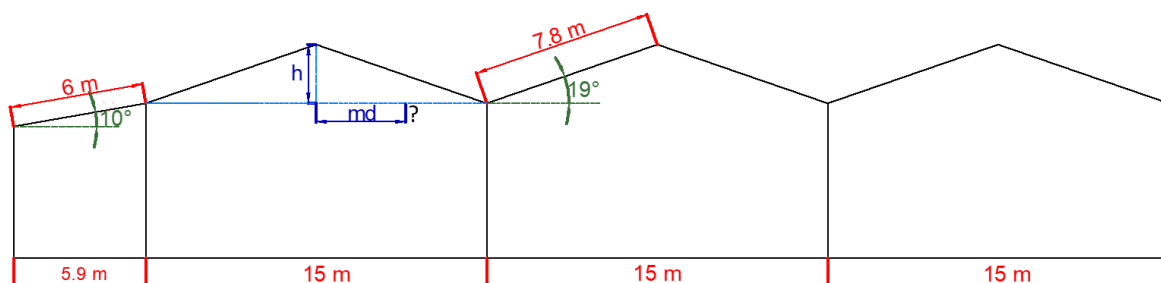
Section plan of the warehouses. (Author's own, adapted with AutoCAD).
